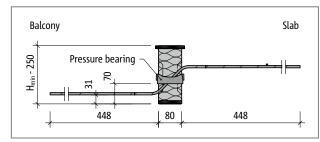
Schöck Isokorb® T type Q-V6: Product section
